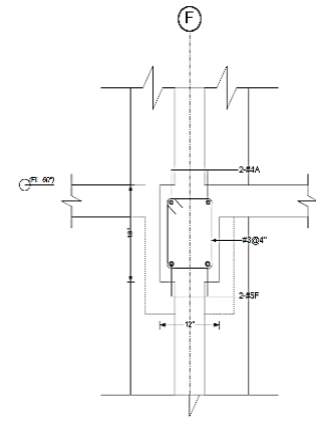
Beam 46 & 55 (Rebar Diagram: Section)
